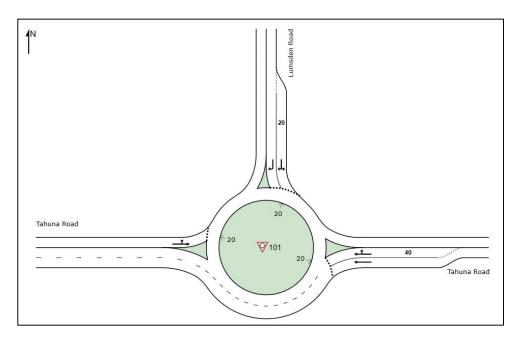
Proposed Intersection Upgrades – Tahuna Road & Lumsden Road Intersection
